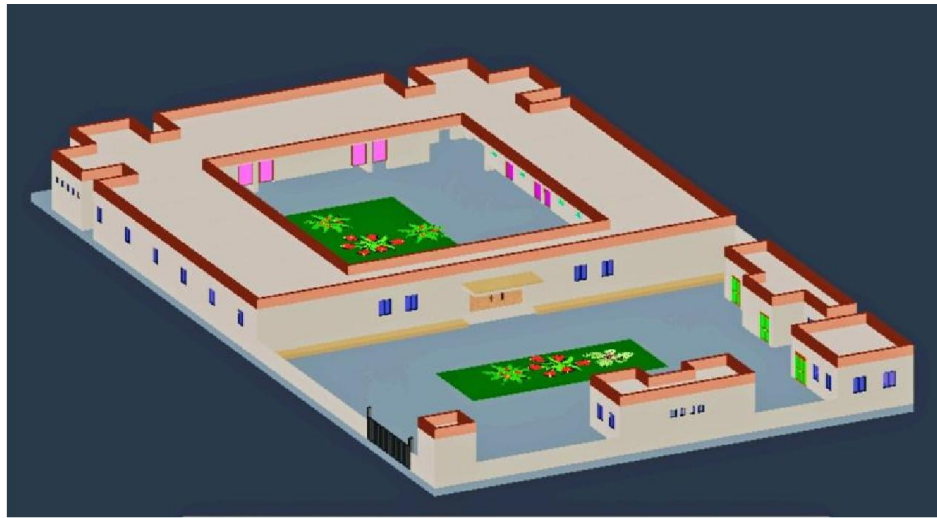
3D LAYOUT OF SCHOOL BUILDING
